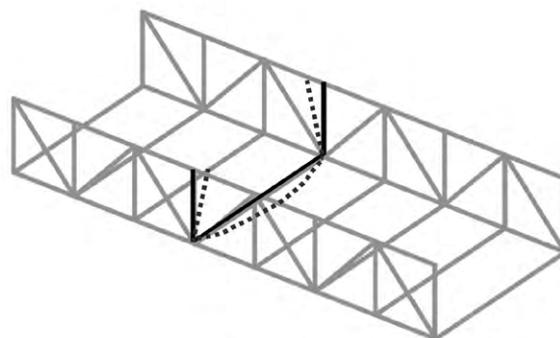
U-Frame action a) I-shaped girders – addressing lateral torsional buckling
